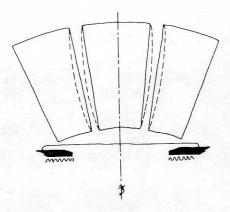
Straight radial aisles are better than aisles which curve or bend.
